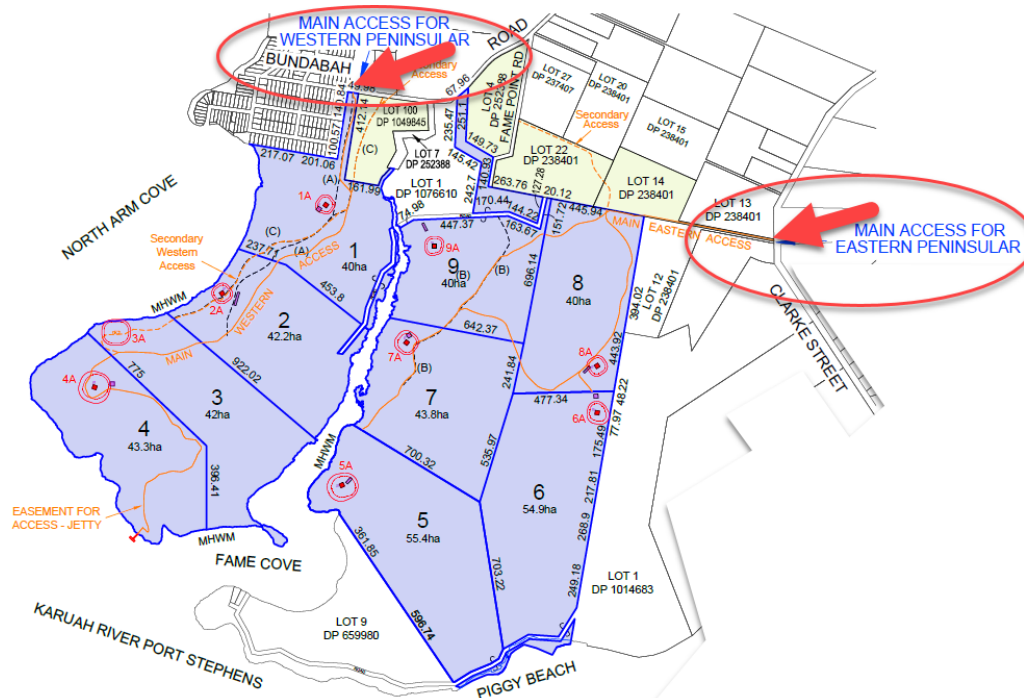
Plan of Subdivision with Proposed Access Roads (Barry Hunt Associates)
